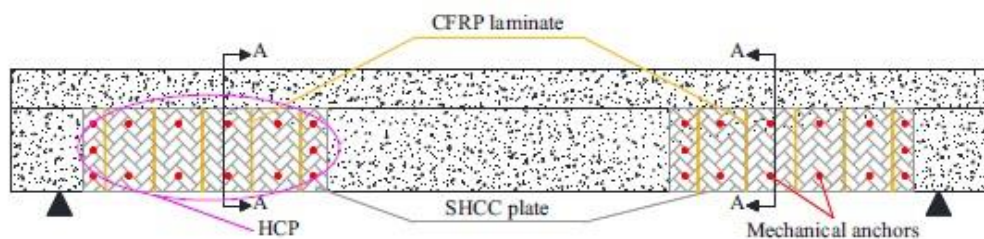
Scheme of (HCP) for shear strengthening of RC beams
